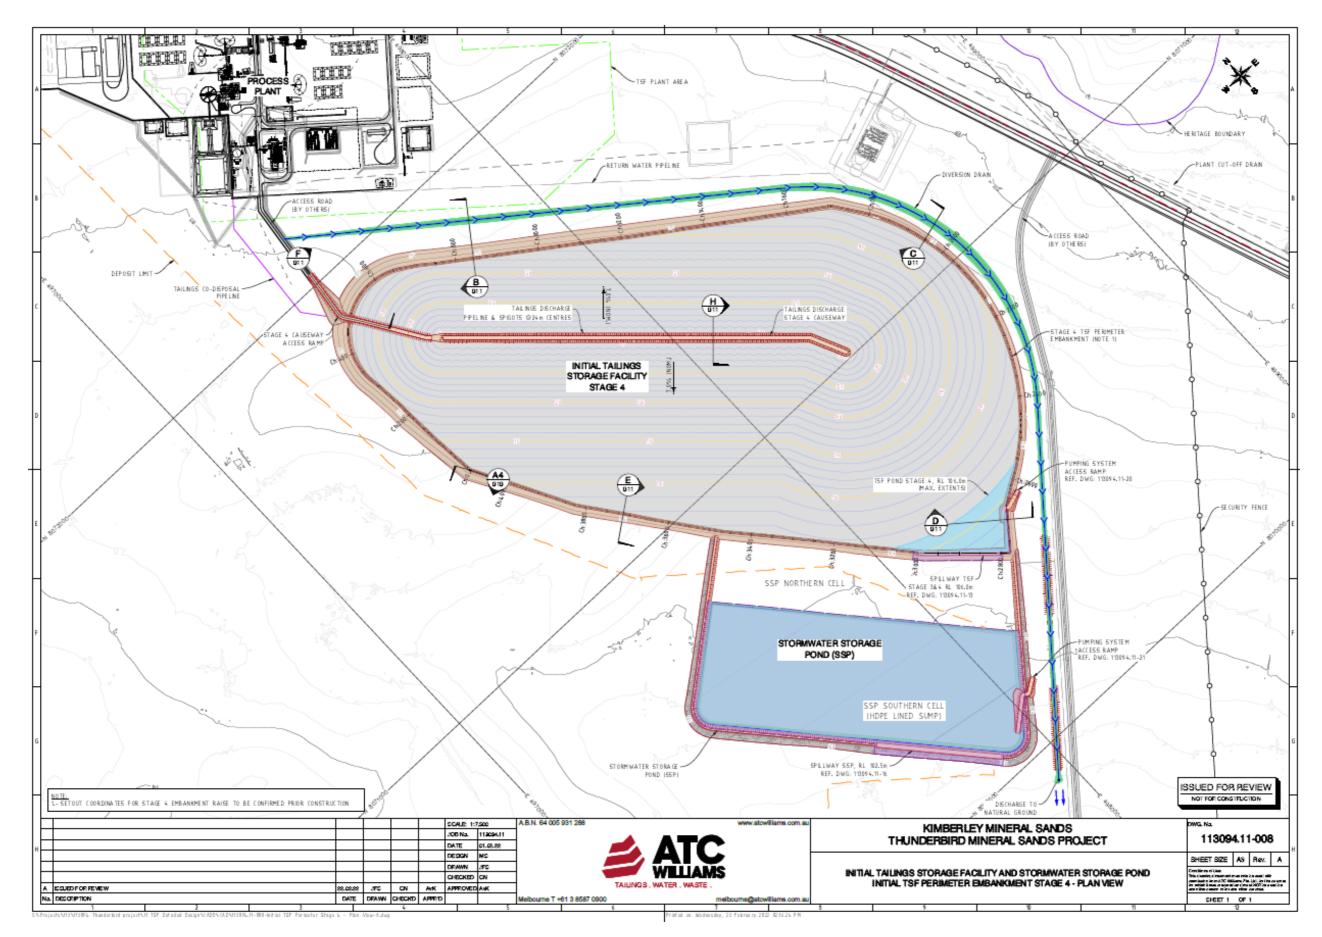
Drawing – Initial TSF and SPP, TSF perimeter embankment stage 4 plan view
